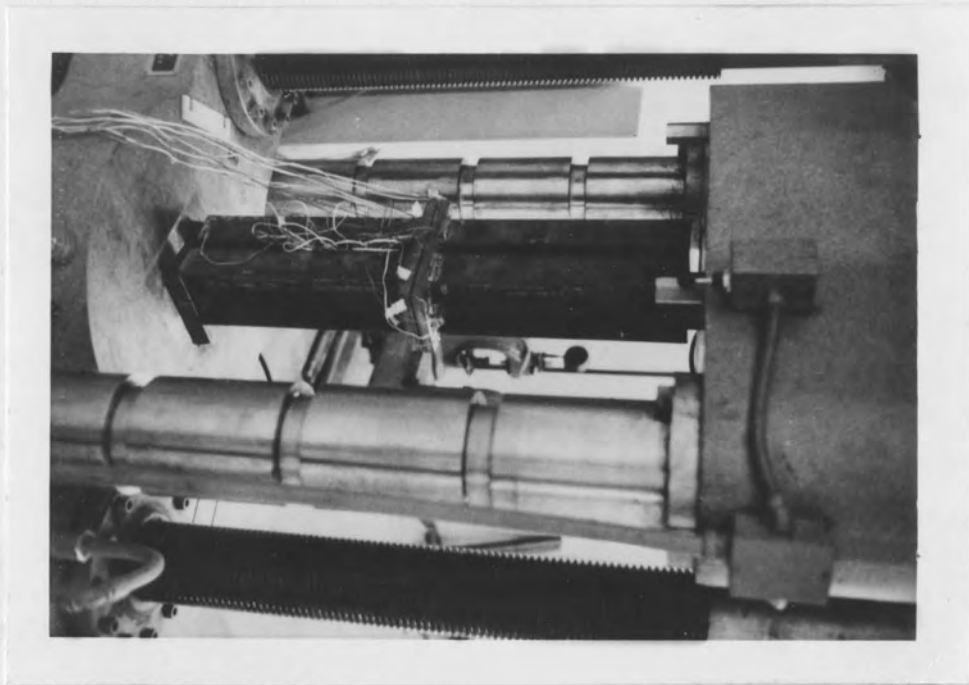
SPECIMEN IN THE TESTING MACHINE
